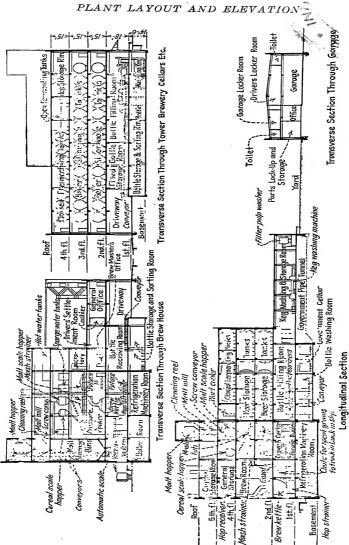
Sectional elevations of a brewery. (Vidor Buhr, Food Ind., 5, 123ff., 1933.)
